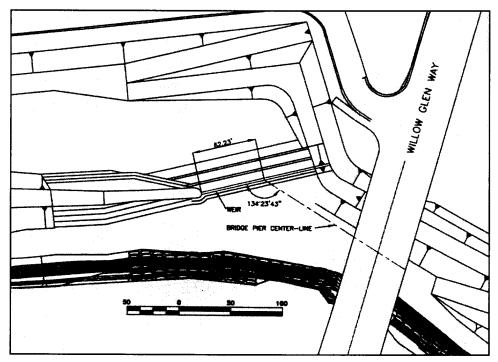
Upper Guadalupe bridge pier center-line location Willow Glen Way
